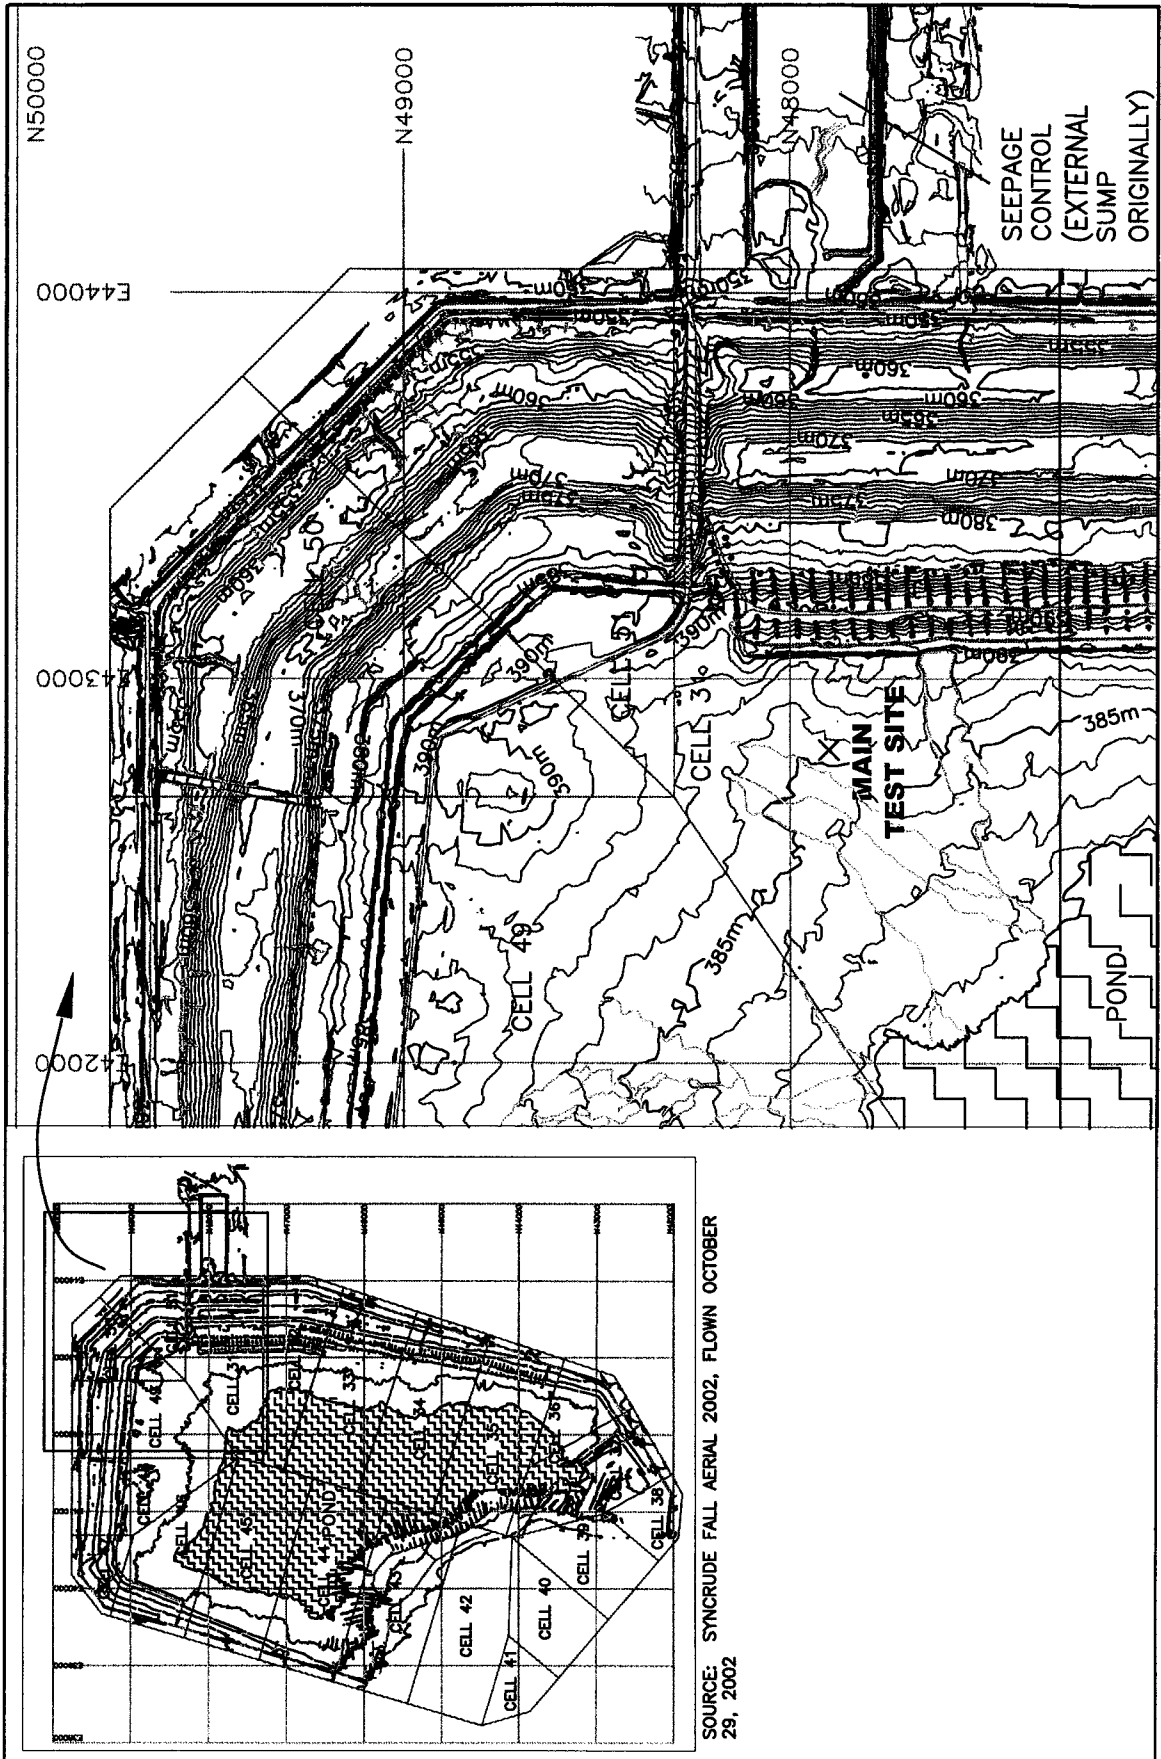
2002 Plan of the Southwest Sand Storage Facility
